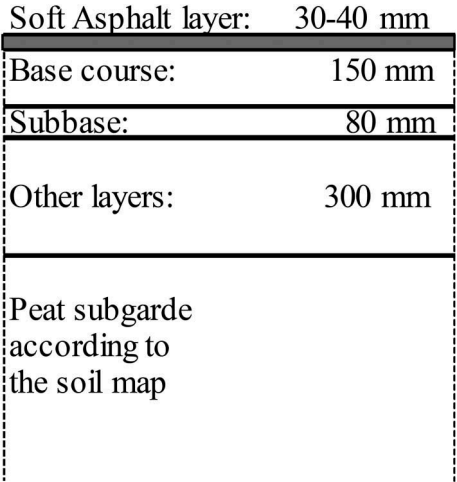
Layers of road structure at the test site in Kyyjärvi.
